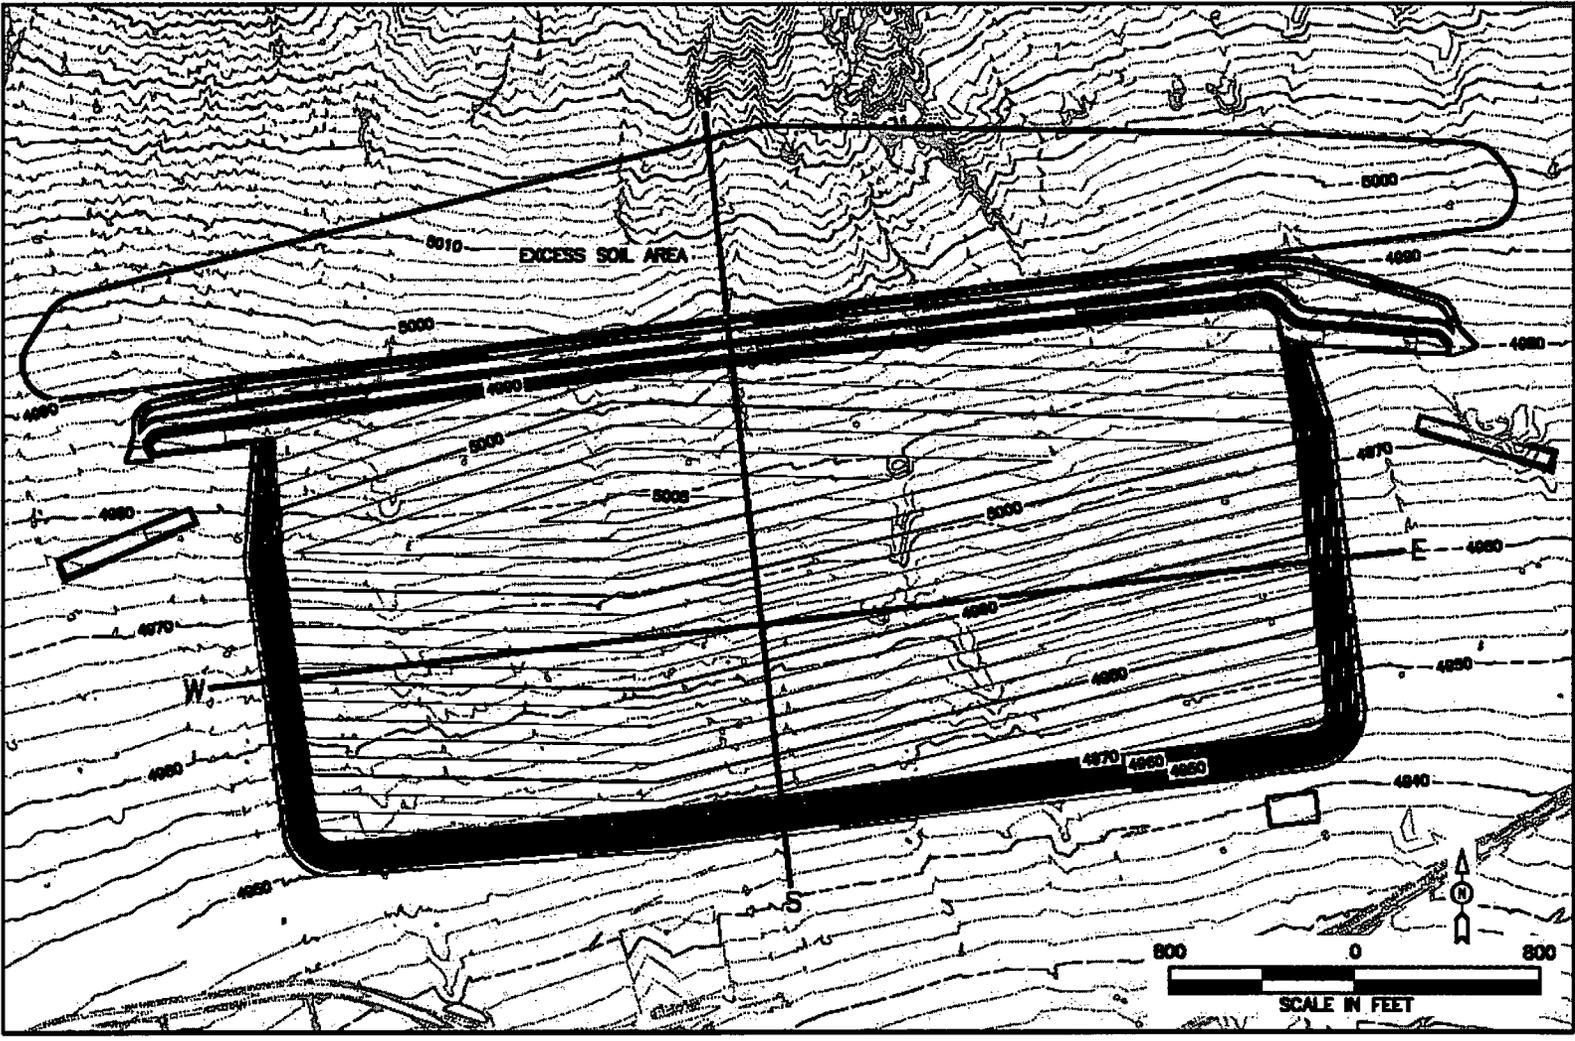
Disposal Cell Layout with Typical Cross-Section Locations
